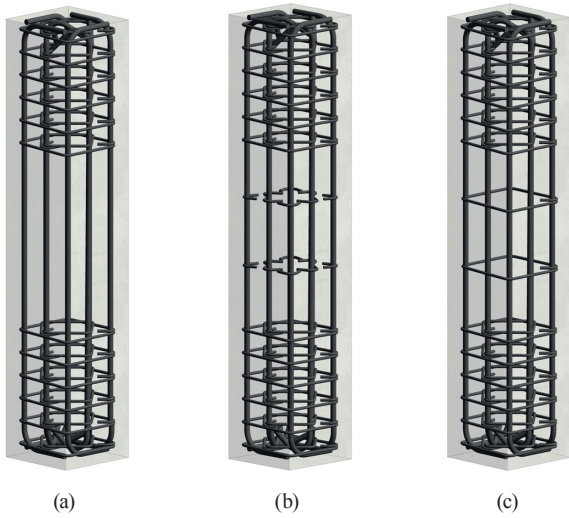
3D view showing the different configurations of outer ties used in group 1: (a) without any tie control column C; (b) V-ties for all longitudinal reinforcing bars specimens CV-4 and CV-10.5; (c) outer traditional tie specimen CO
